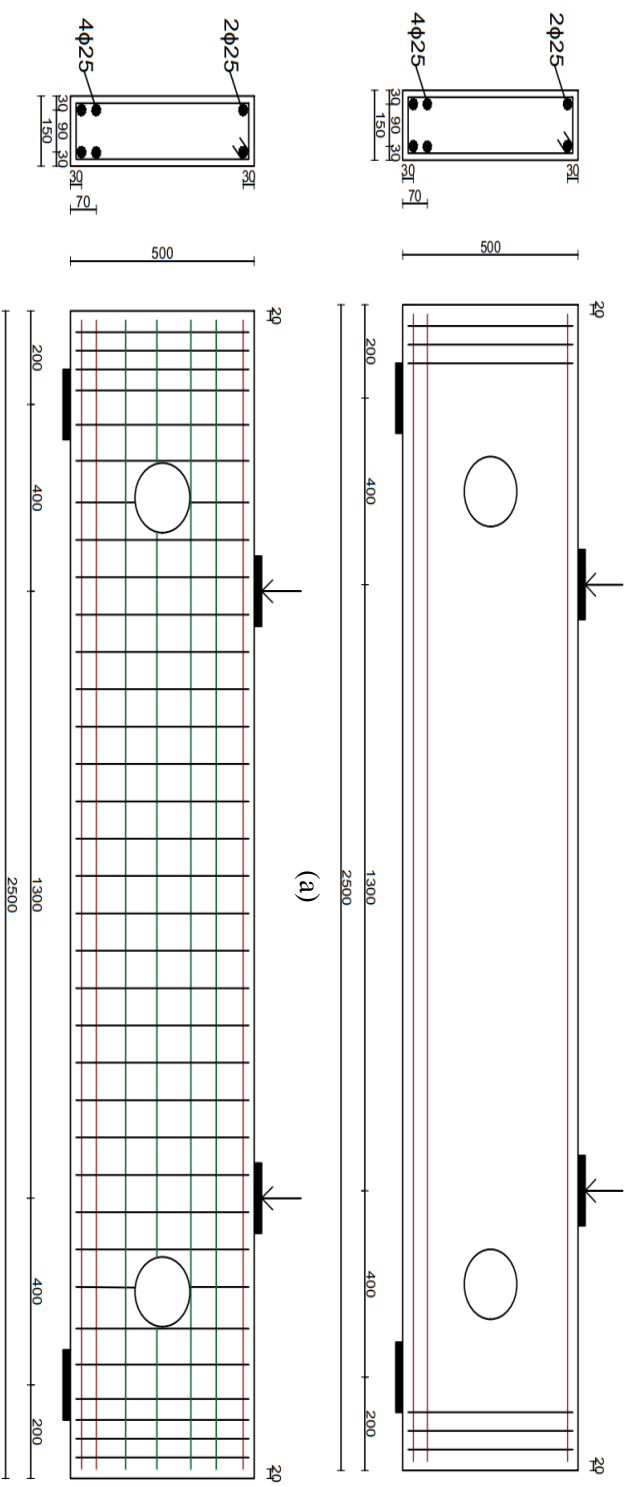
Details of deep beam specimens of group N (dimensions are in mm): (a) A beam without traditional shear reinforcement; (b) A beam with traditional shear reinforcement
